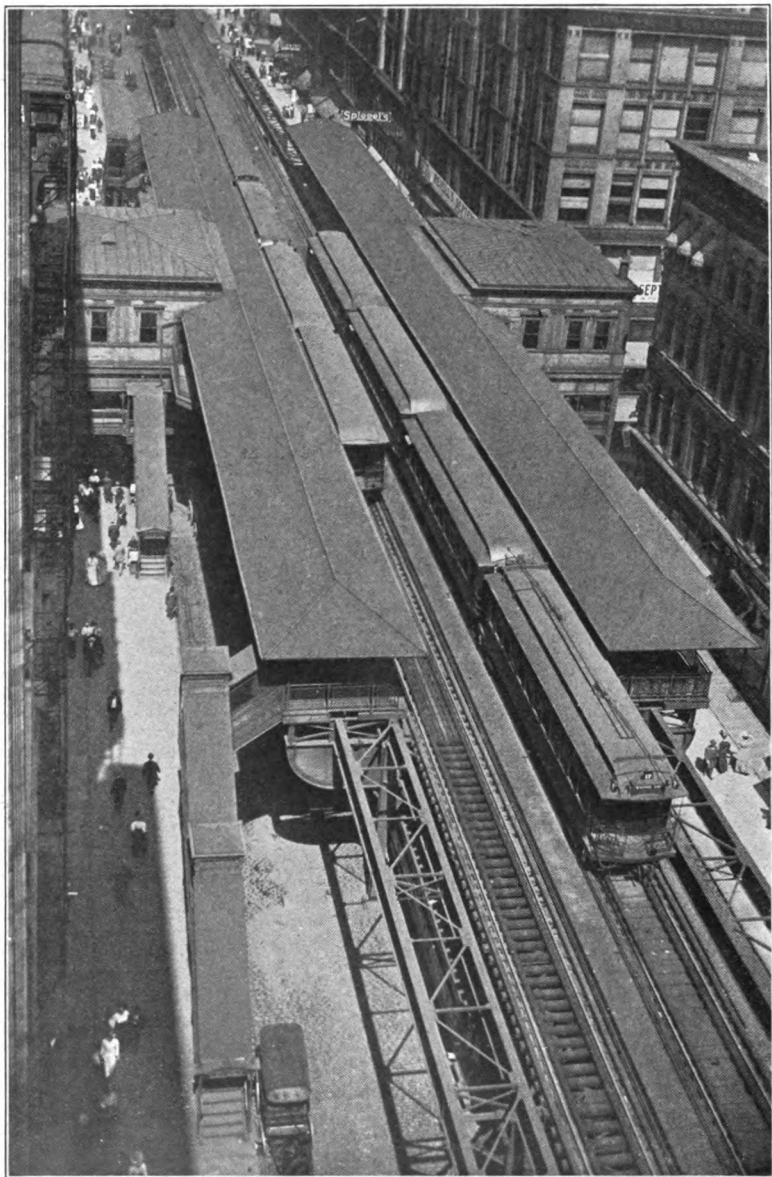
VIEW LOOKING DOWN ON ADAMS AND WABASH STATION, SHOWING THE SIZE OF THE STATION BUILDING OVER THE ROADWAY OF THE INTERSECTING STREET, THE WIDTH OF THE PLATFORM CANOPIES, AND THE RELATIVE PROPORTION OF THE ENTIRE STREET OCCUPIED BY THE PRESENT STATION STRUCTURE.
